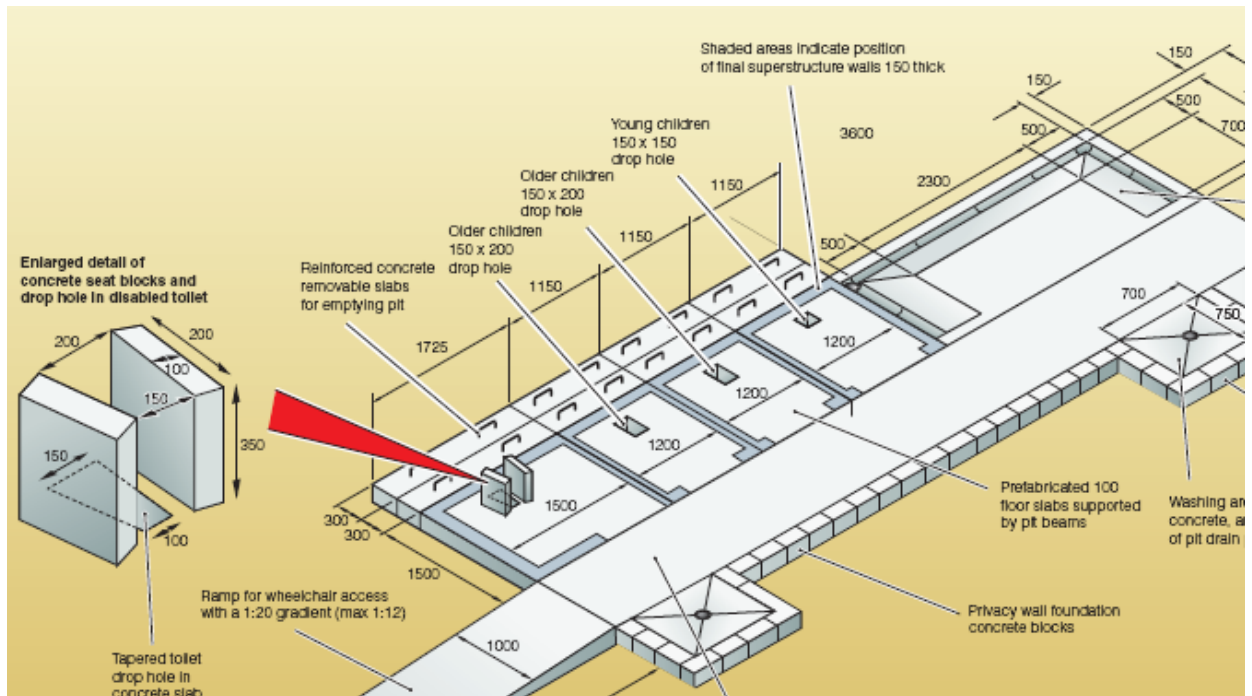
Floor layout for a school toilet block (Part of a larger drawing)
